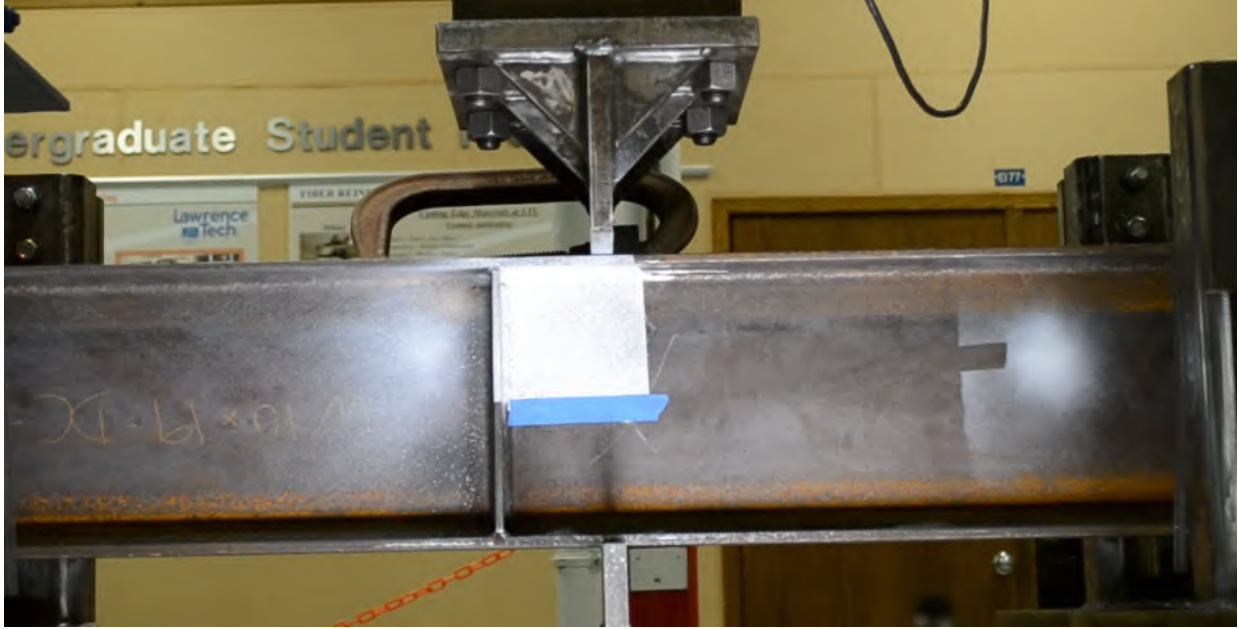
W10X19-DC-NA after testing emphasizing flange bending
